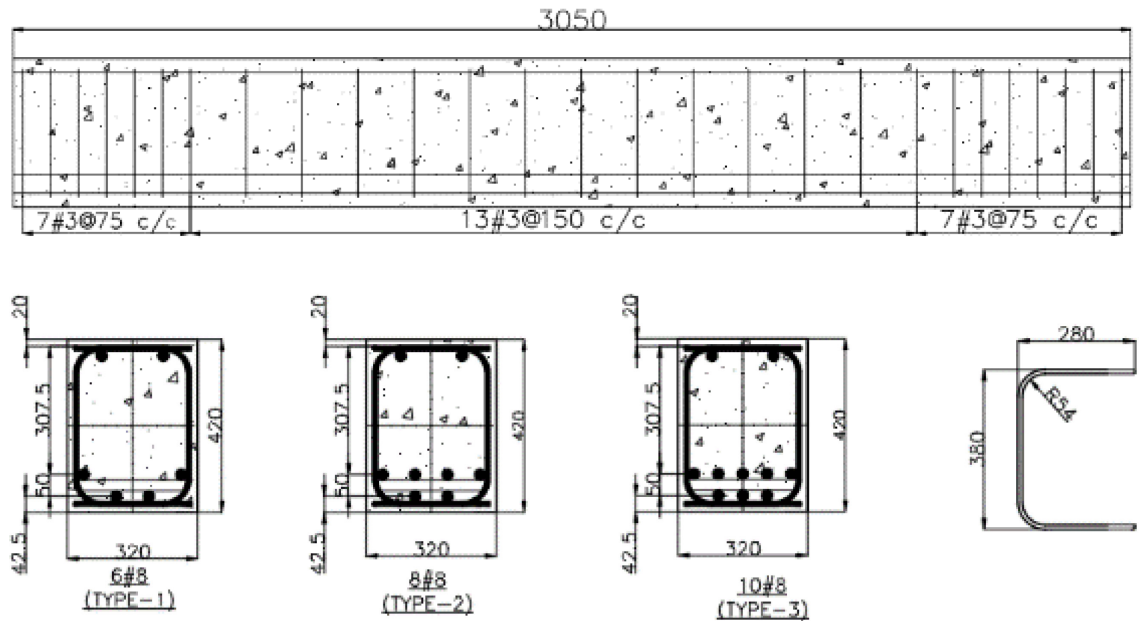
Beam dimensions and reinforcement details (dimension in mm)
